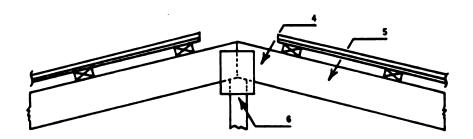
Location of test sites, Barn B. Truss No. 2, 6.1m (20') from south end. North elevation. Flashing, bird netting not shown.
